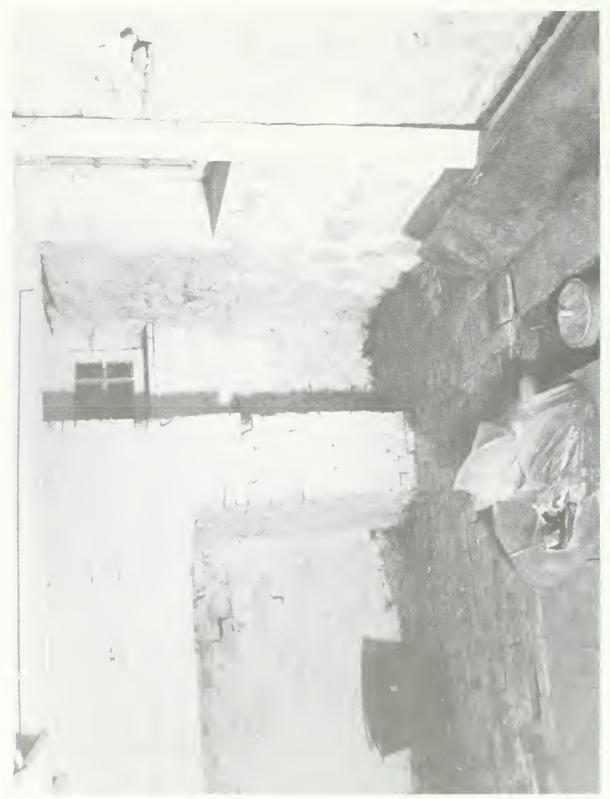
Schuyler House: Cellar kitchen (Room 004), view to south along west foundation wall (ca. 1990).
